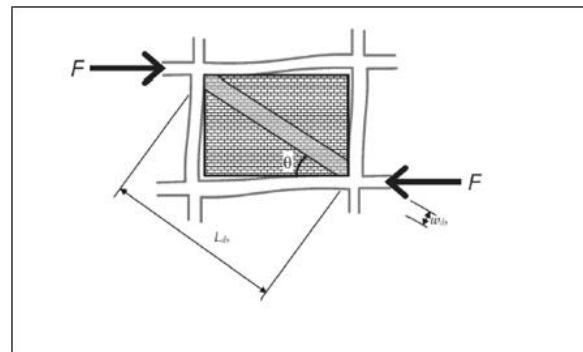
Equivalent diagonal strut (EQVT) of masonry infill wall
